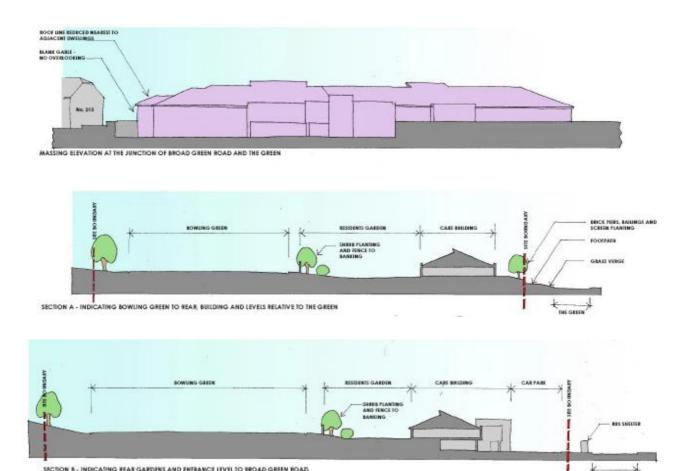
Site sections indicating the change in levels between the bowling green to the rear and the highways to Broad Green Road and The Gre
